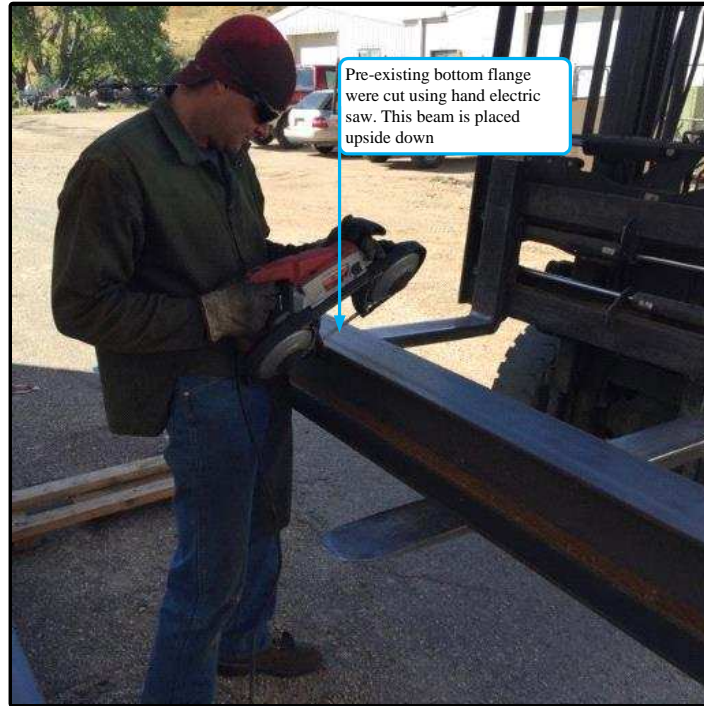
Electric hand saw using in cutting the pre-existing bottom flange cracks
